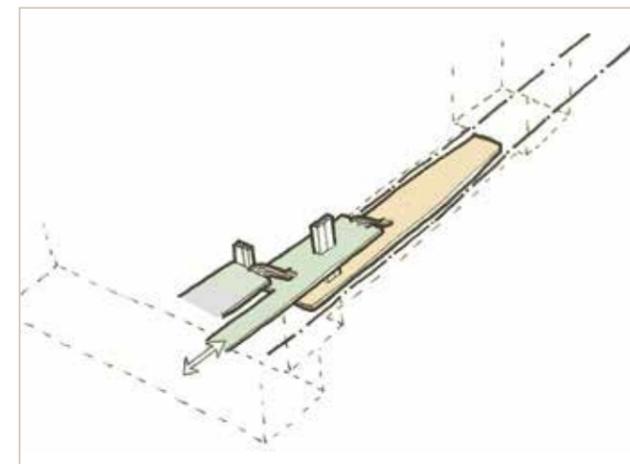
The proposed platforms at Parkville station are located deep underground, providing the opportunity to situate an entrance near Grattan Street if desired and integrate the station with a new tram super-stop on Royal Parade.
